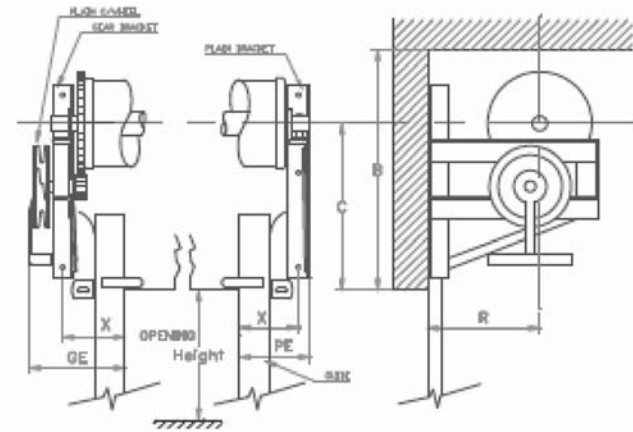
BRACKETS LAYOUT FOR 18.8:1 GEARING
